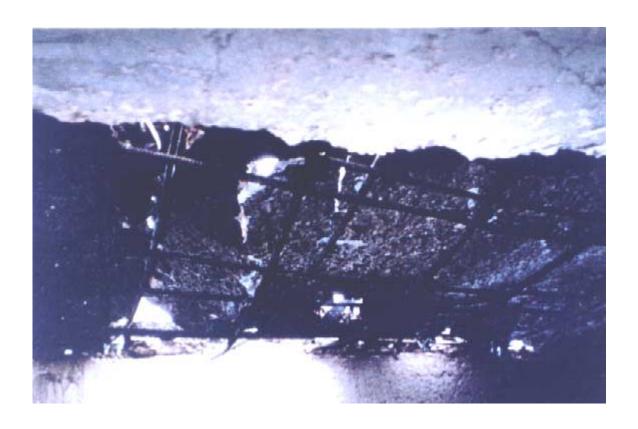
The above photograph depicts the ceiling region inside the bunker. Note the pieces of concrete missing, due in part to the spalling phenomenon. Also note that several holes are present in the ceiling, not just single circular hole in the center area of the roof.
